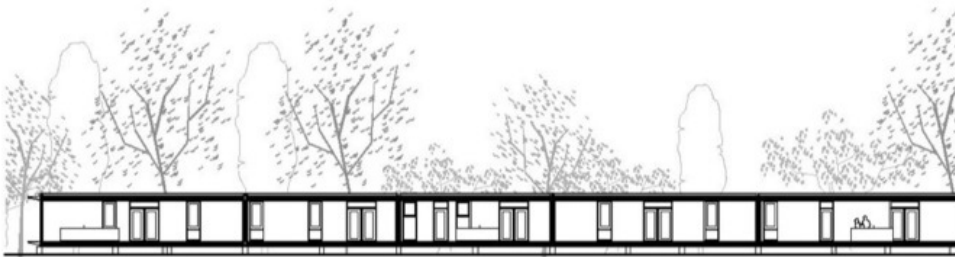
Section [bureau SLA, n.d.]
